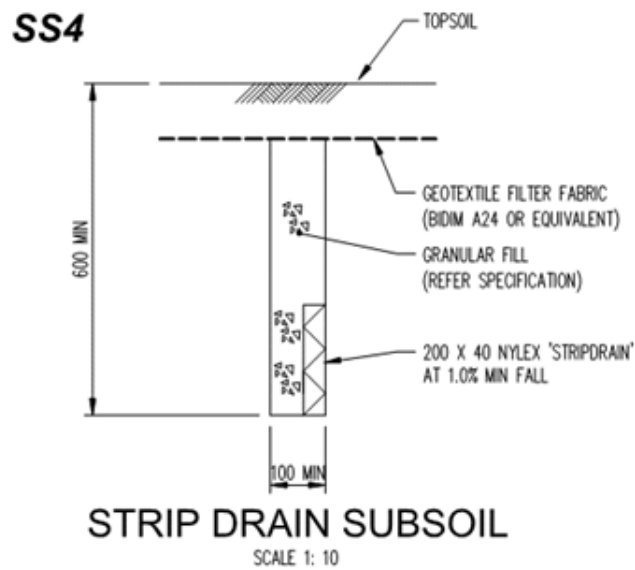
Section showing details of required trench cut for a subsoil Nylex strip drain. (Source: TTW 180309)
